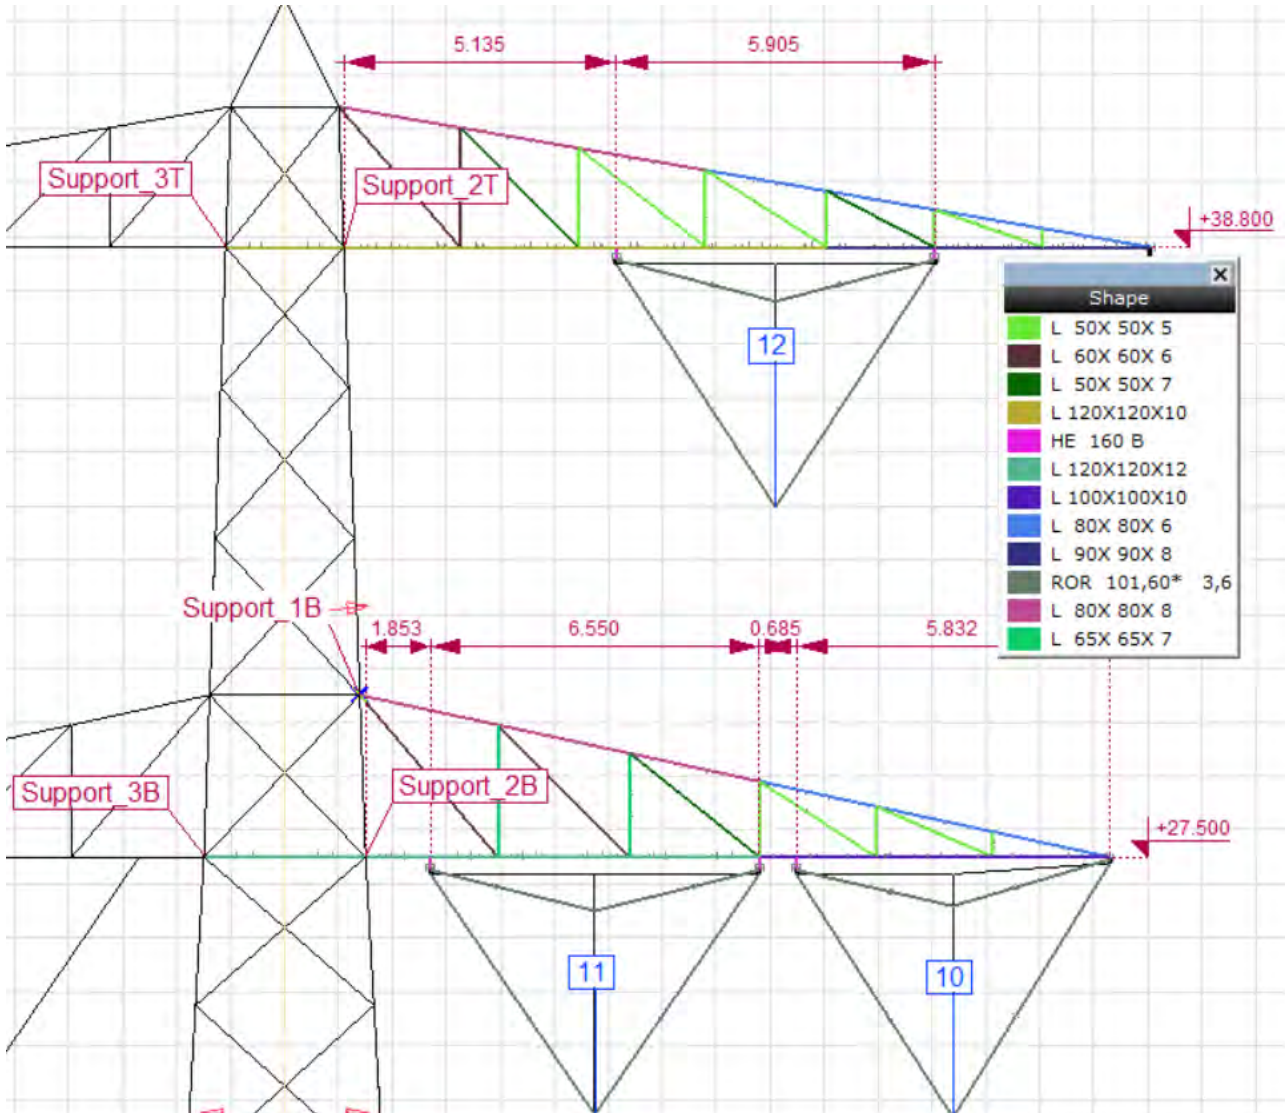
Location of the v-ketting insulator assembly in S-6 tower
